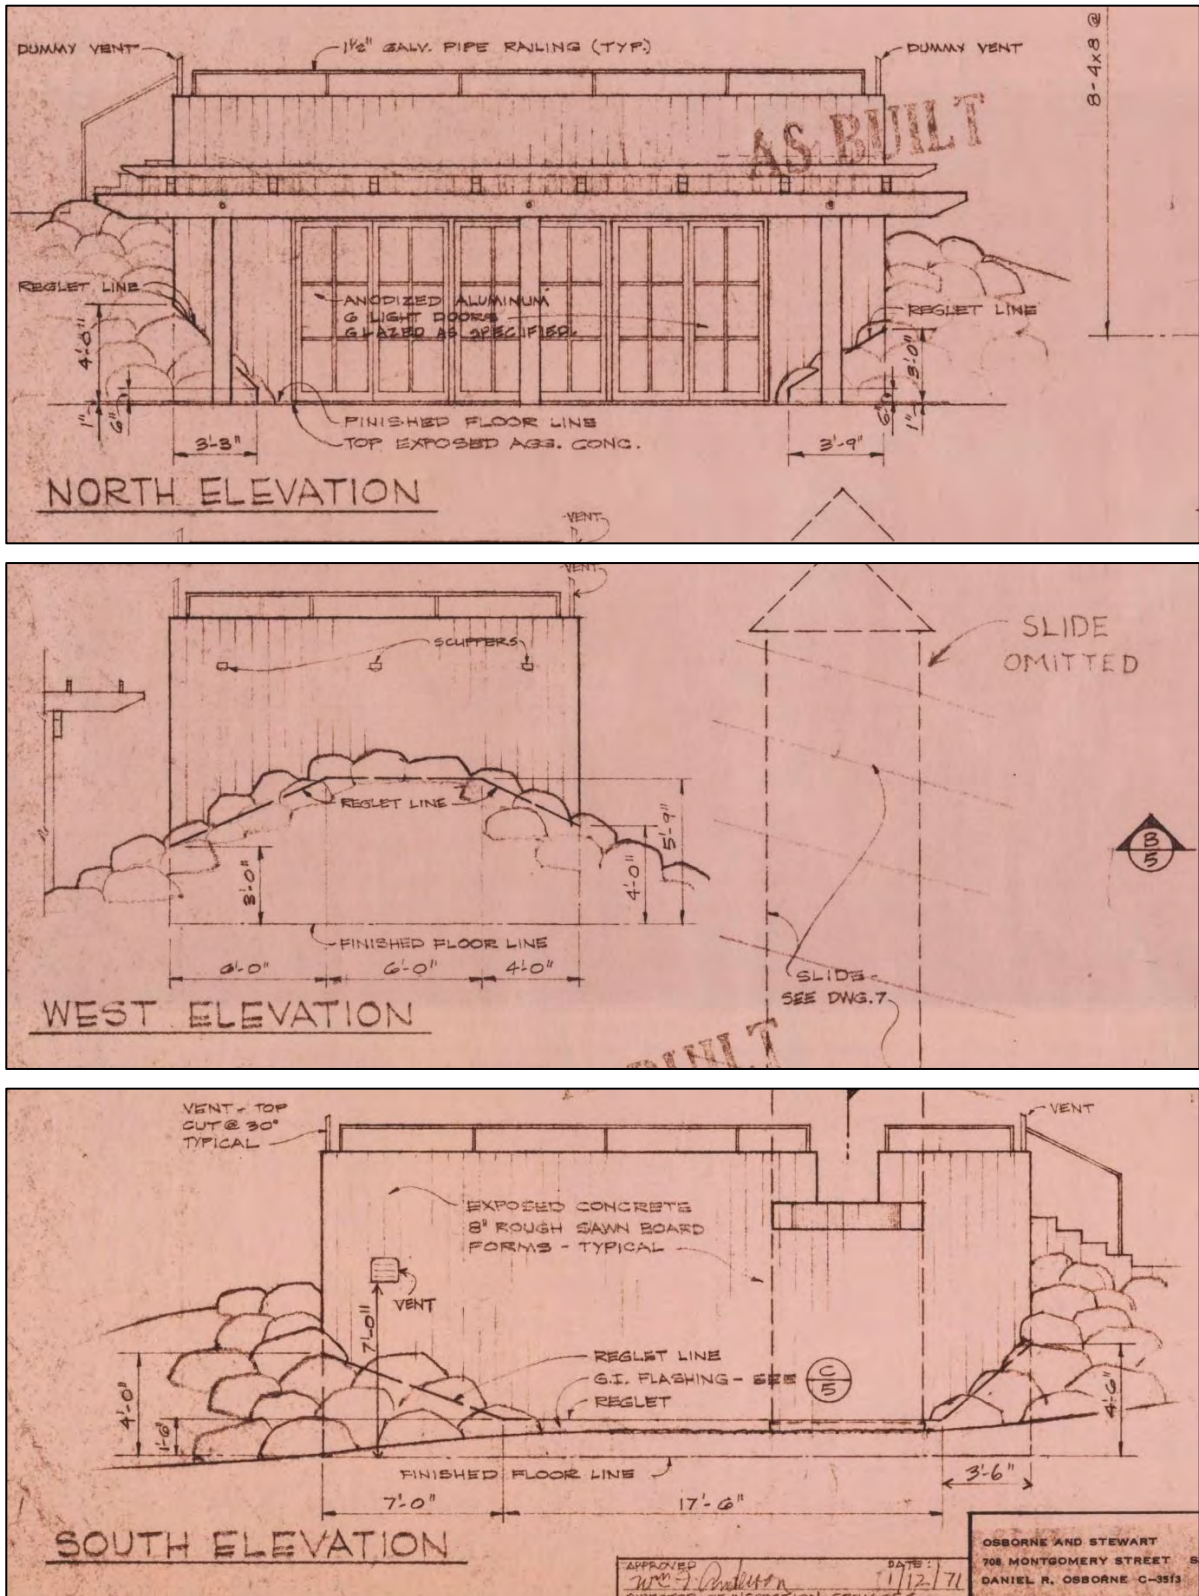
As-built drawings of Willard Park Clubhouse, façade (top), with original cobblestone features on east and west elevations; west elevation (center); and south elevation (bottom)
